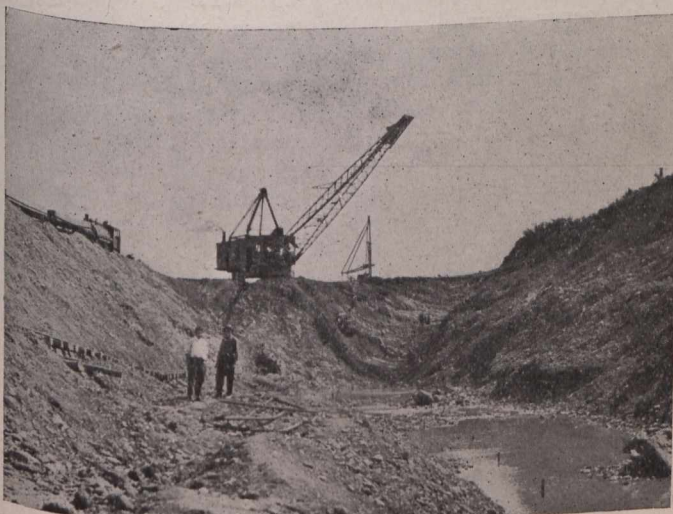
Drag Line Excavator in Lock No. 1, Port Weller.
